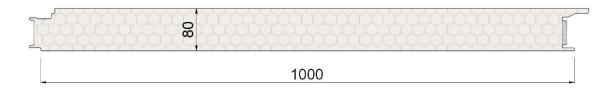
Detail drawing of the finalised design RE-SKIN roof sandwich panel with the advanced tongue-andgroove connection [AutoCAD]
